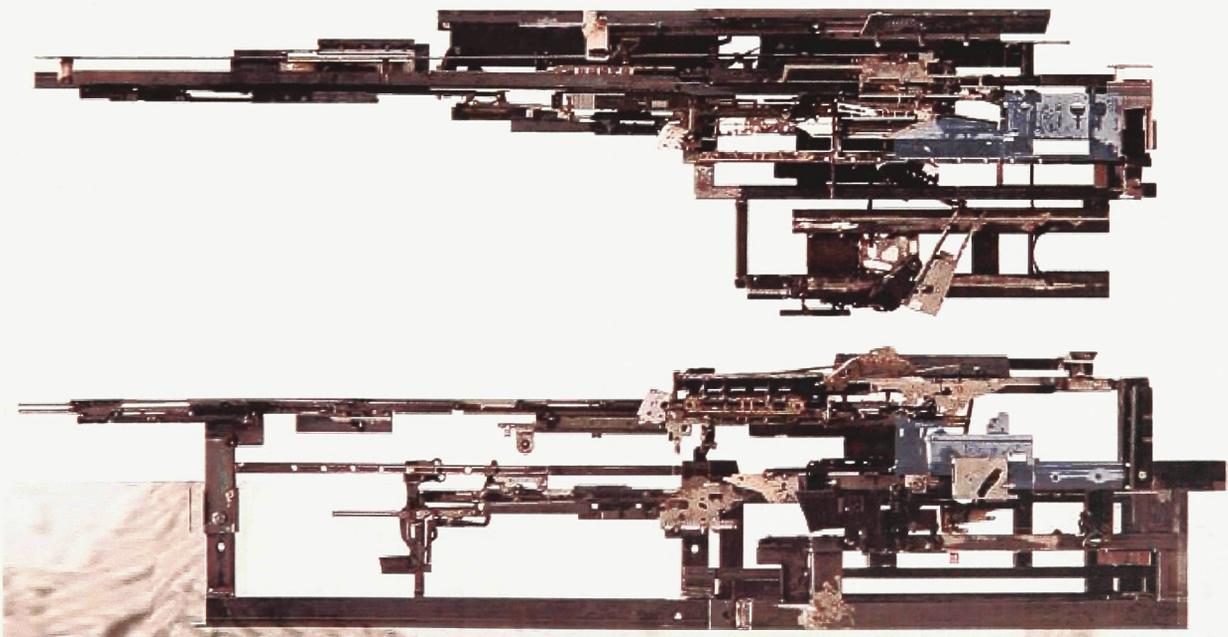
Airport Access MRT Terminal. Phase Three (B). Plan (above) Elevation (below).
